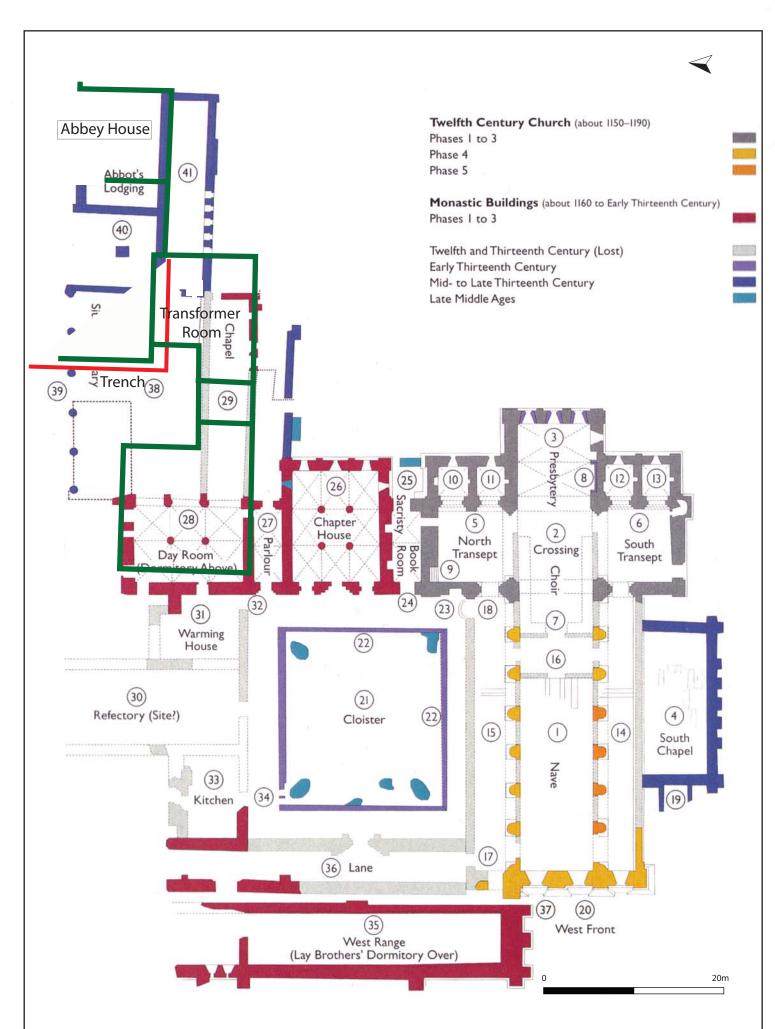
English Heritage plan of Buildwas Abbey showing the approximate location of the WB trench (bright red), Abbey House and the Transformer Room building (green)
